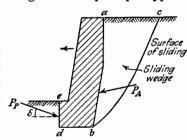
Earth pressures acting on retaining wall at instant of failure.
